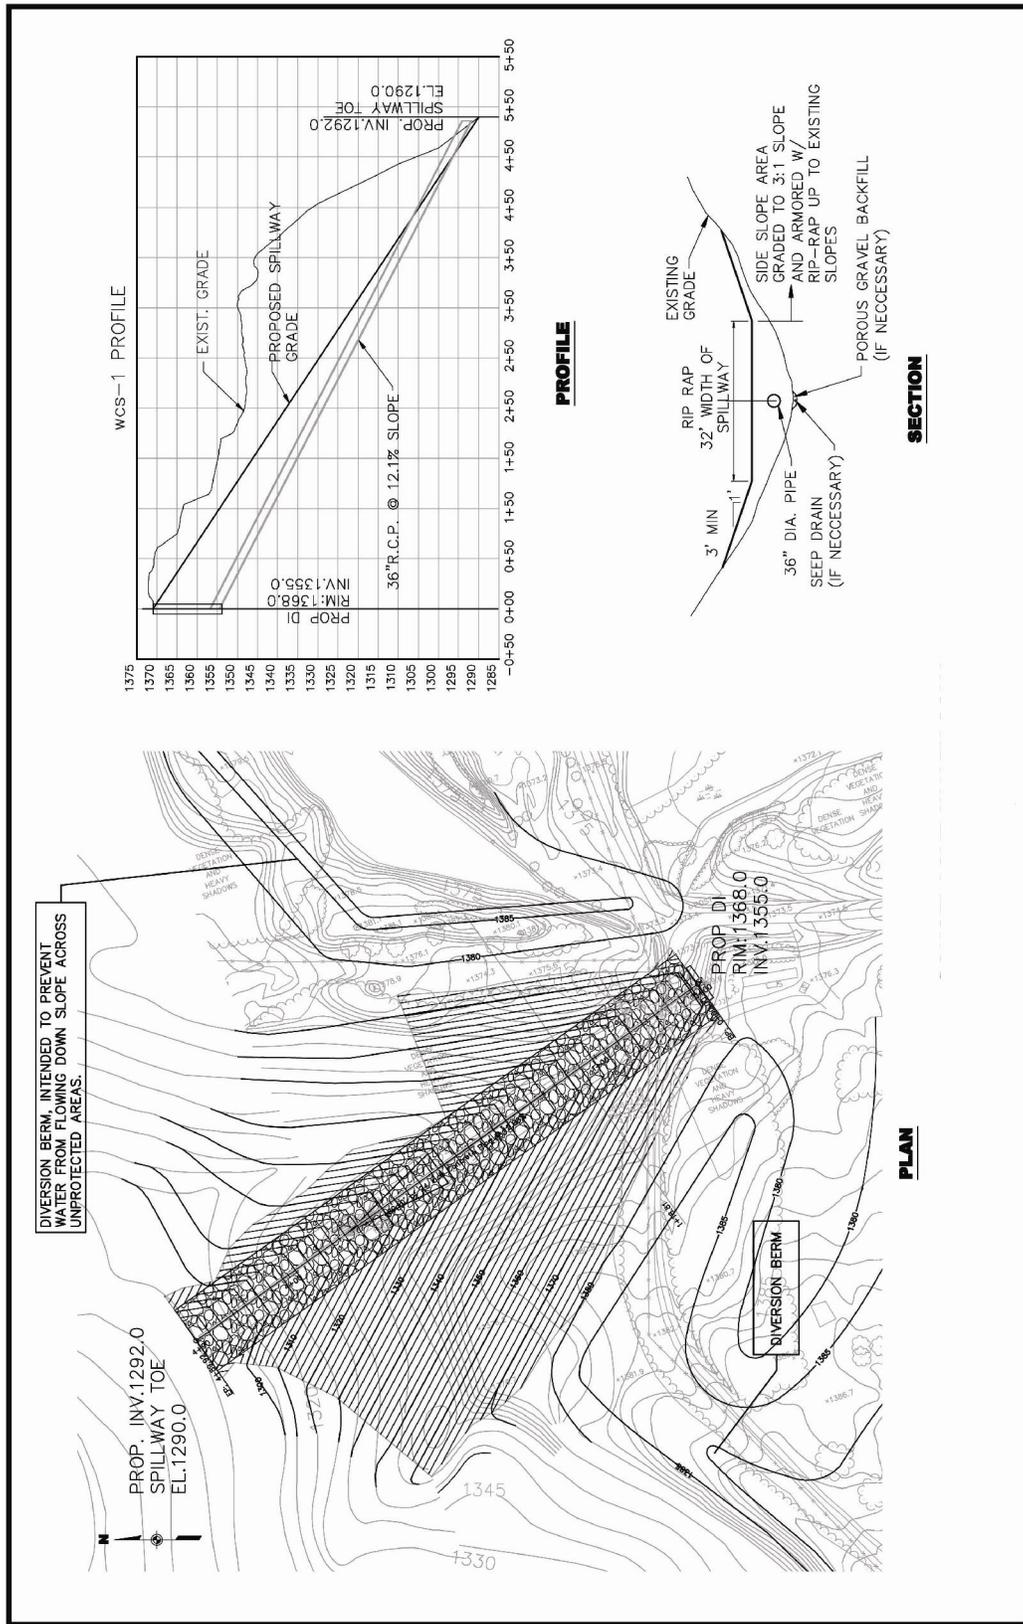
Conceptual Water Control Structure Details (WCS-1)
